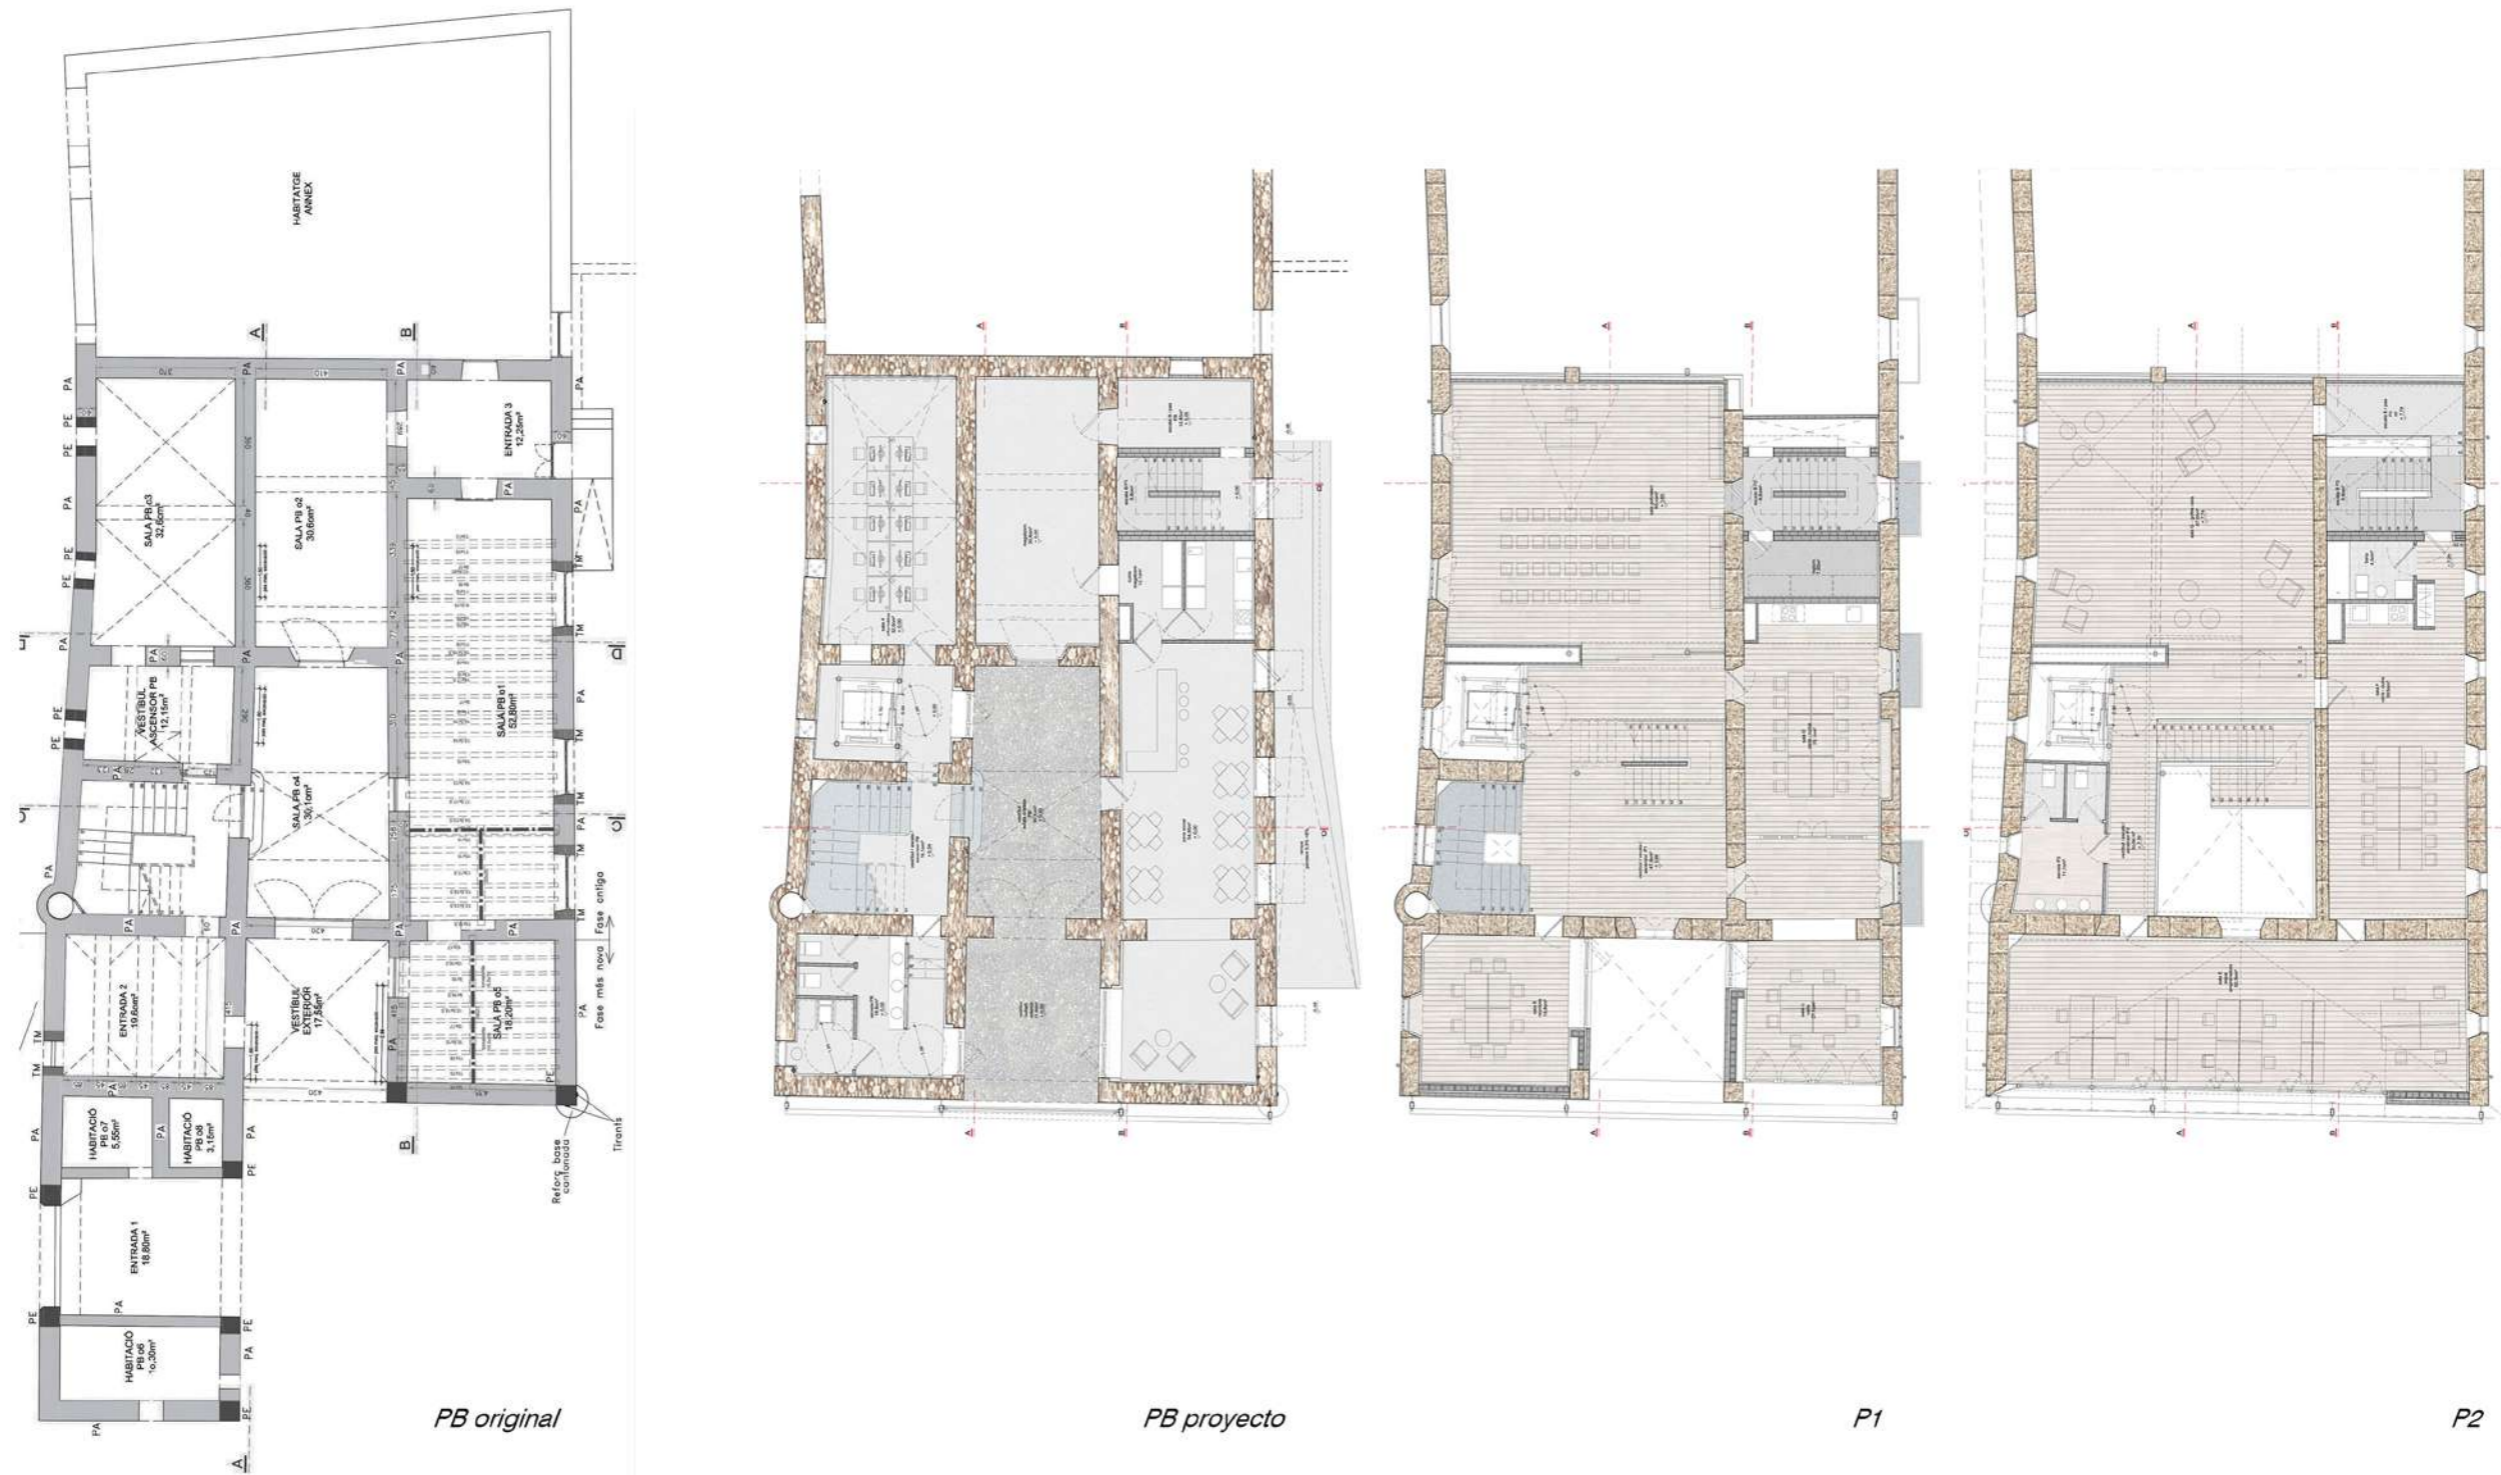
Floor plans (from left to right: Original ground-floor; Project's ground-floor, First-floor, and Second-floor).
